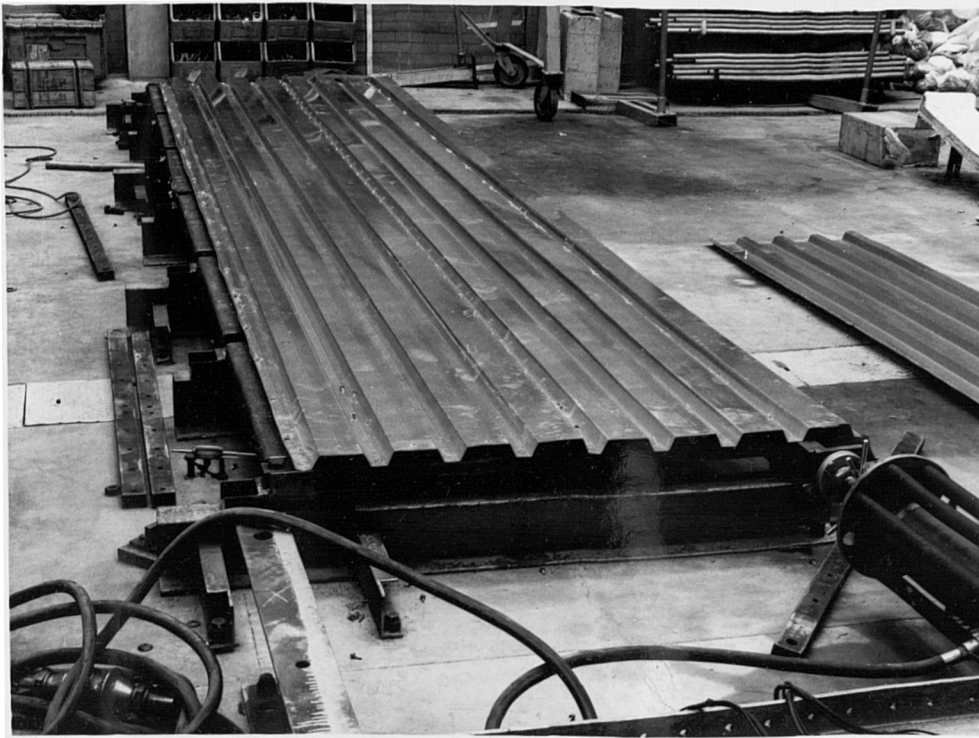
Test rig is shown clad with profile 1 fastened to one intermediate purlin
